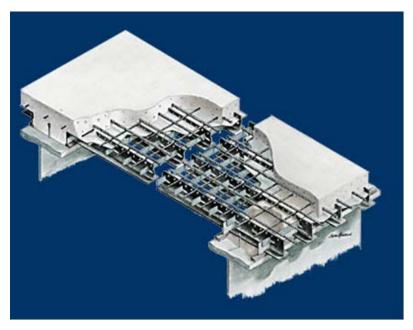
Exodermic Deck Details (source: D.S. Brown Company)
